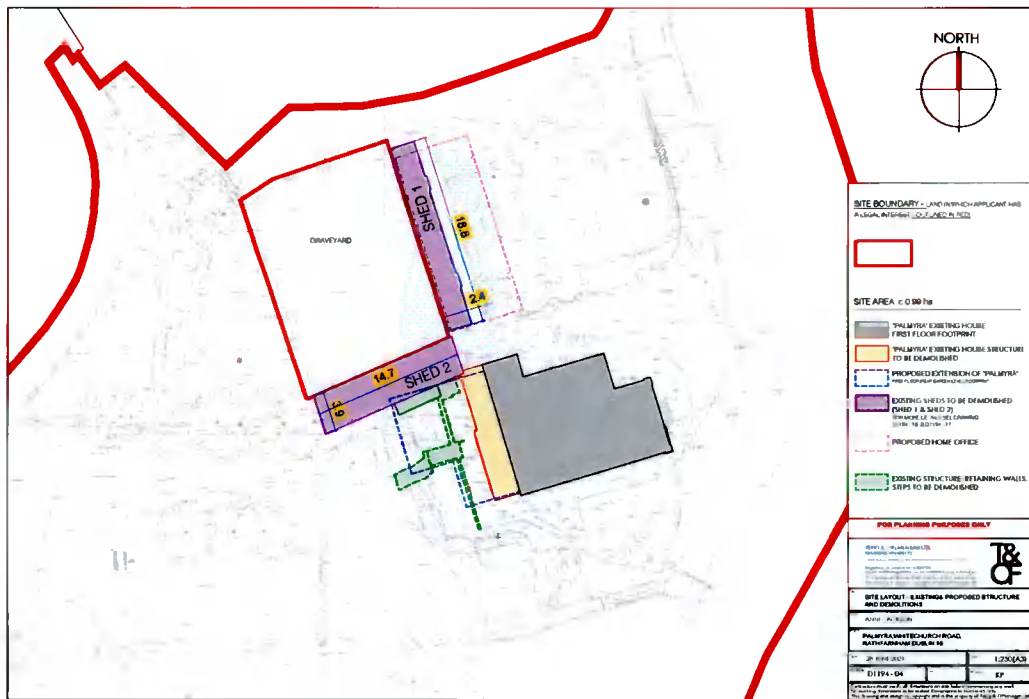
Site layout indicating proposed Demolitions (Sheds 1 and 2)
